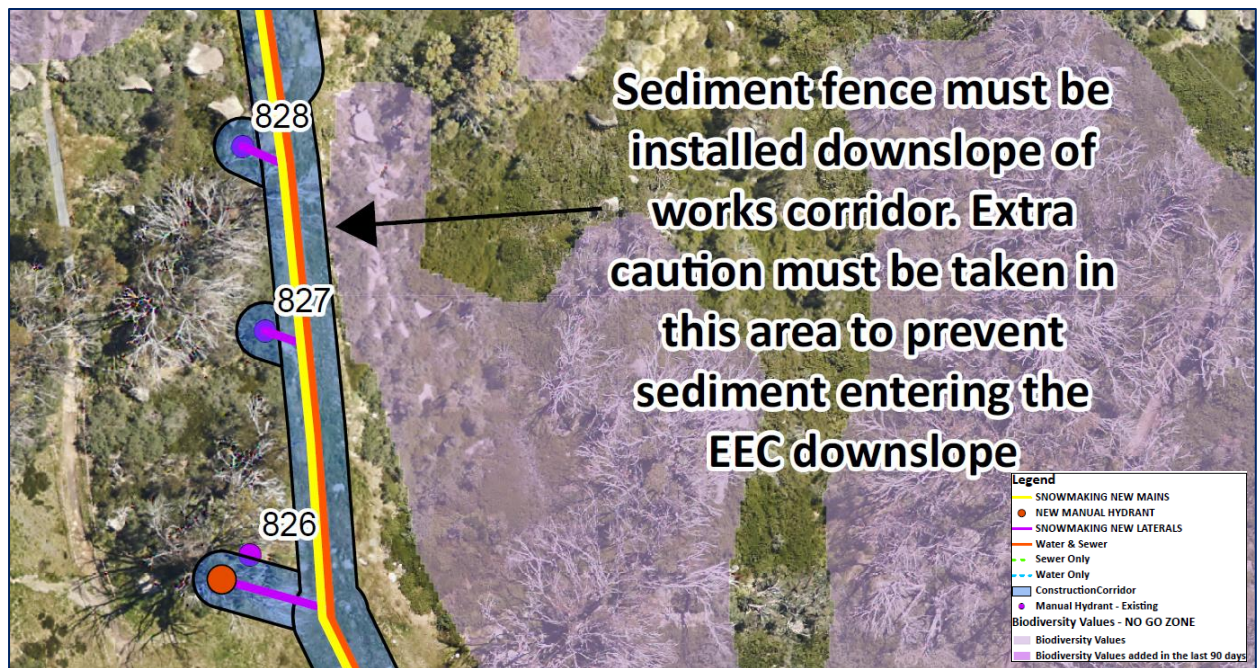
| BVM and area of works and construction corridor reduction (Source: Applicant's documentation)
